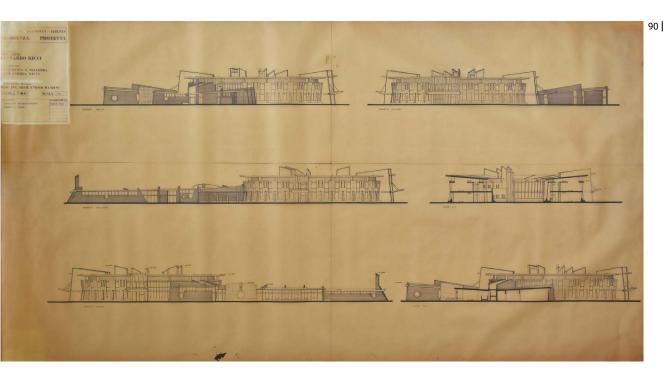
Project for "Casa Protetta", planivolumetric, plan, elevations, Casa Studio Ricci.
